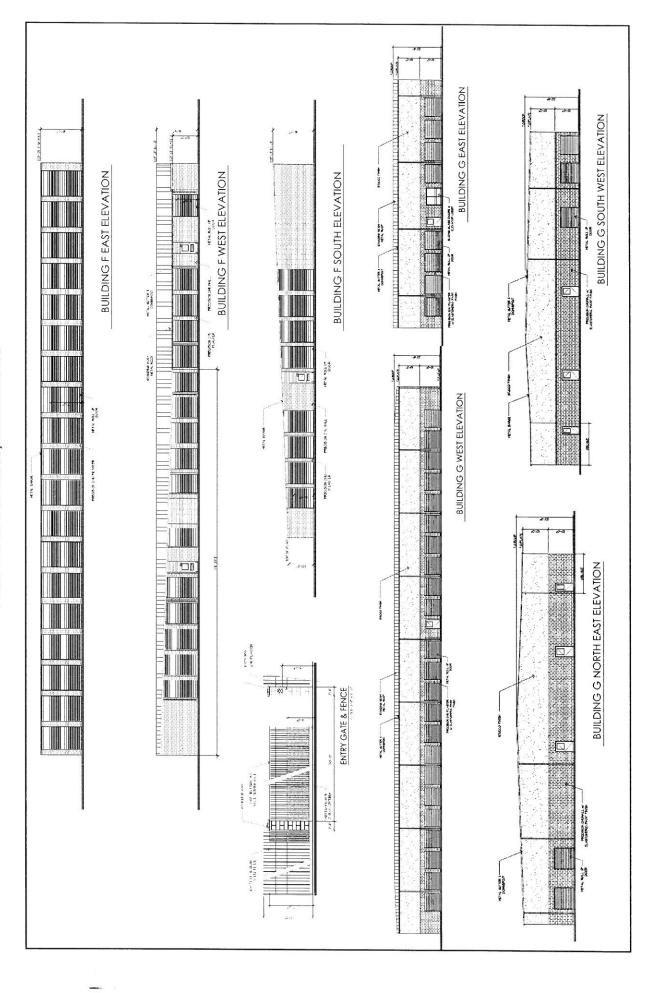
C PLOT PLAN NO. 25998, ELEVATIONS
